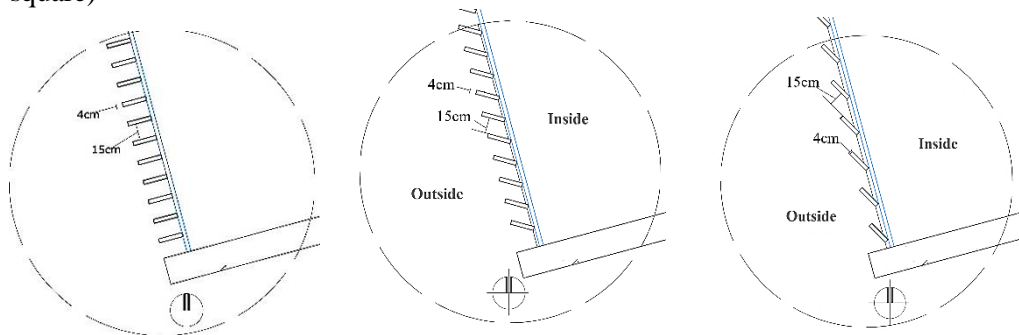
Key plan showing vertical louver on existing case building (south breeze square)
